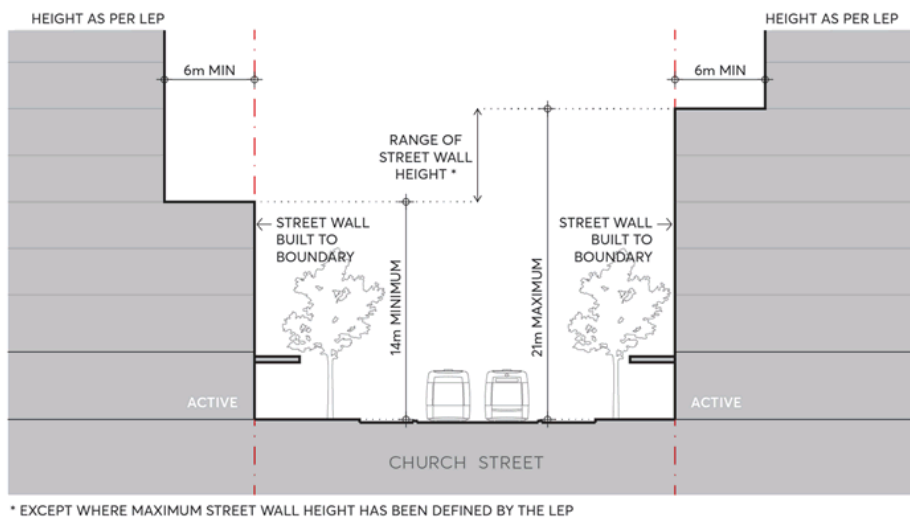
Church Street North Special Area Required Setbacks & Built Form
